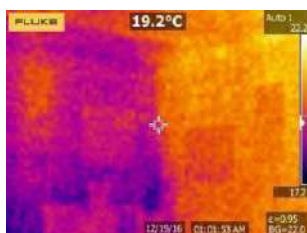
is an external view showing heat escaping through the house wall (no cavity wall) from a radiator. Reduce by insulating or fixing reflective foil to the wall behind the radiator.
